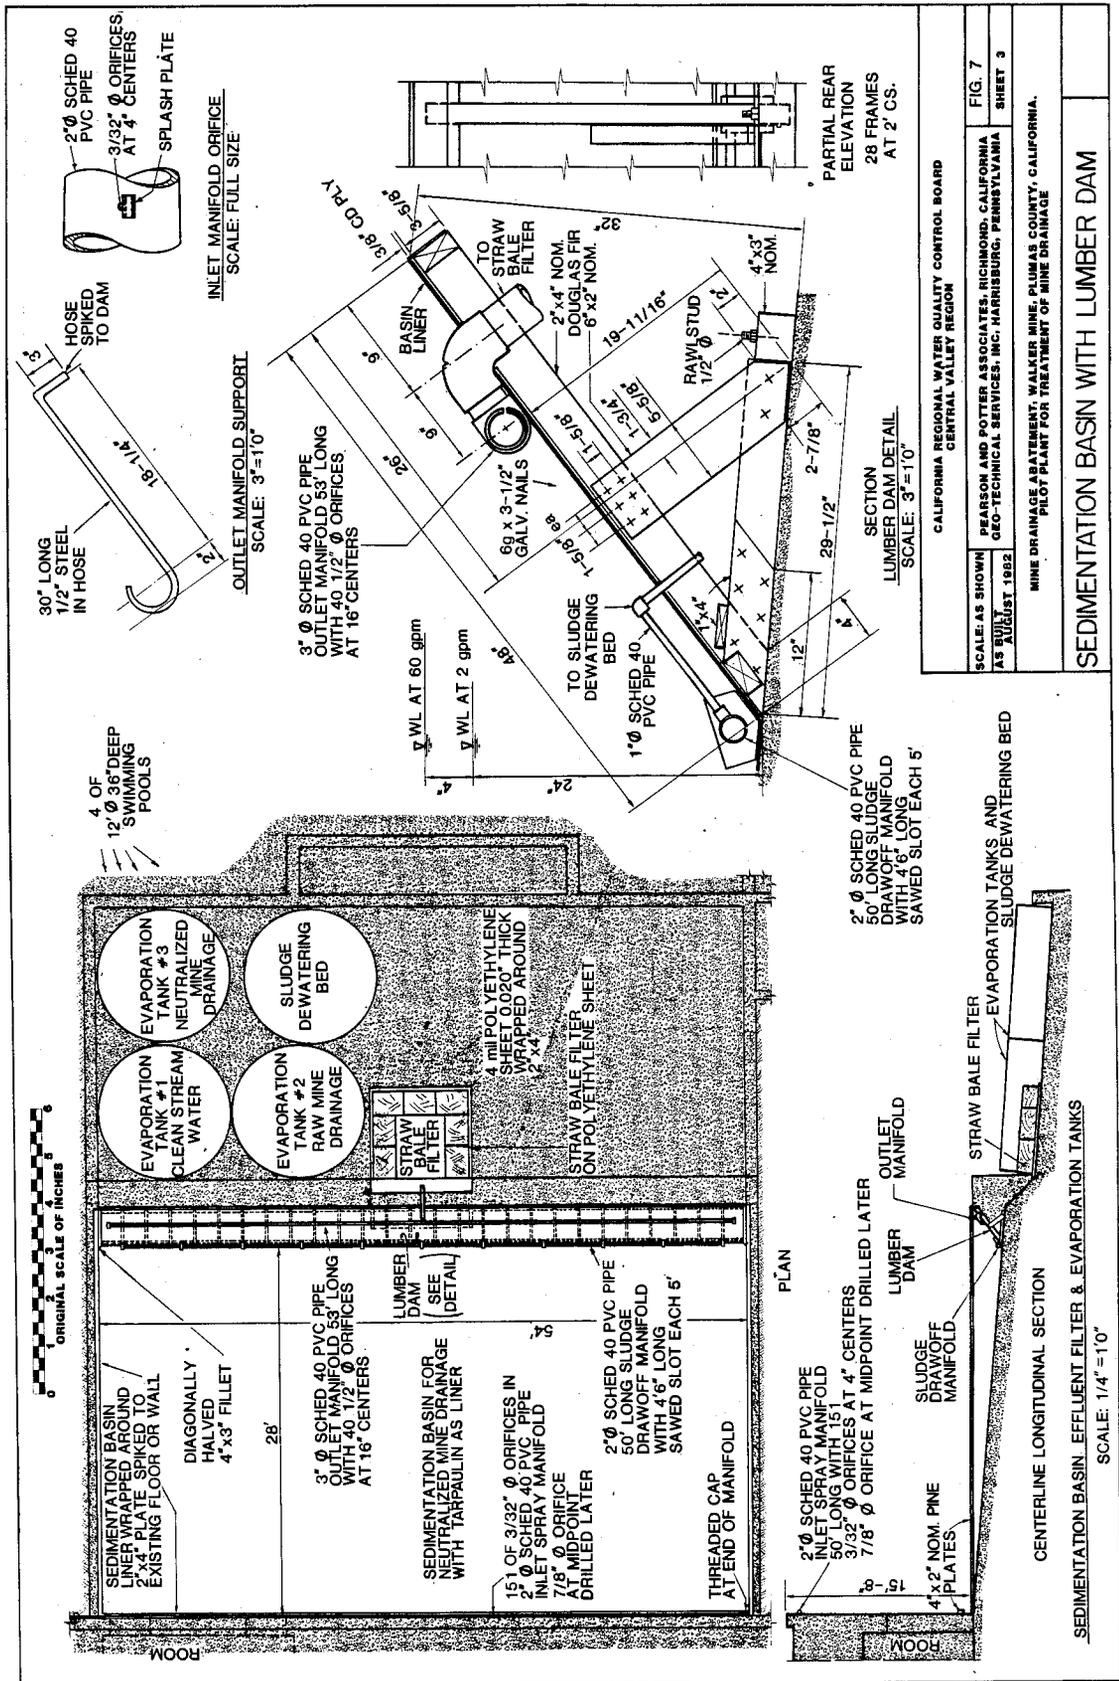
Sedimentation Basin with Lumber Dam (As-Built Construction Drawing Reduced to 25% Size).
